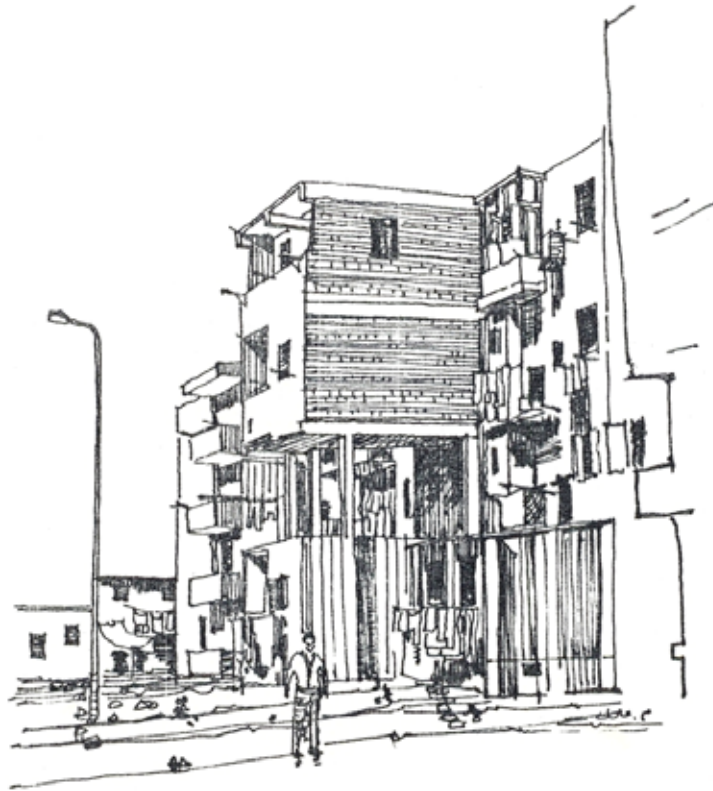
Extensions and alterations of 2<sup>nd</sup> floor - block 2:
